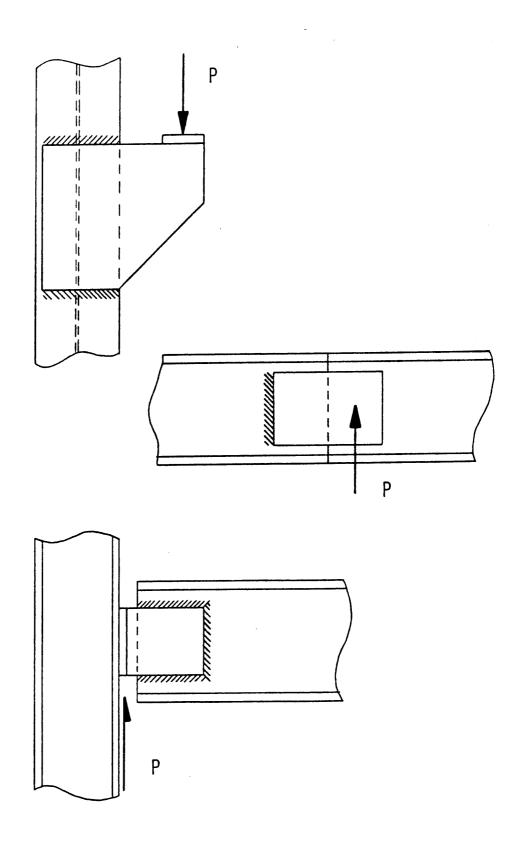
Eccentrically Loaded Welded Connections
